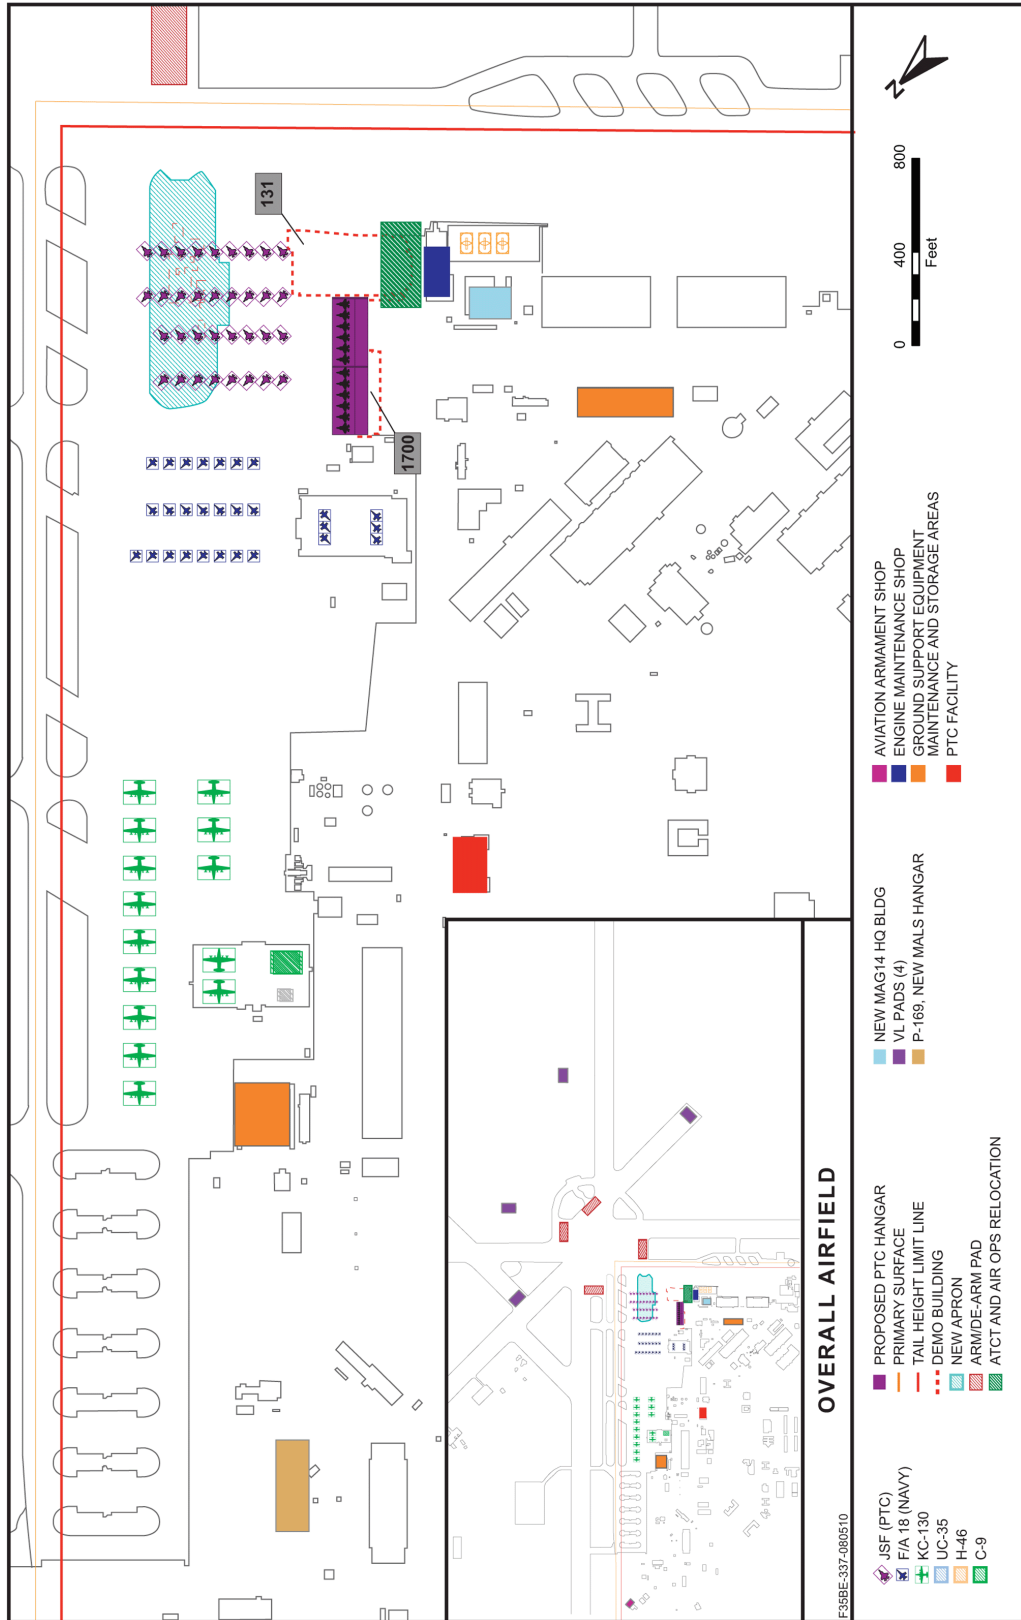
Alternative 2 Proposed Aircraft Flightline and Support Facility Construction at MCAS Cherry Point
